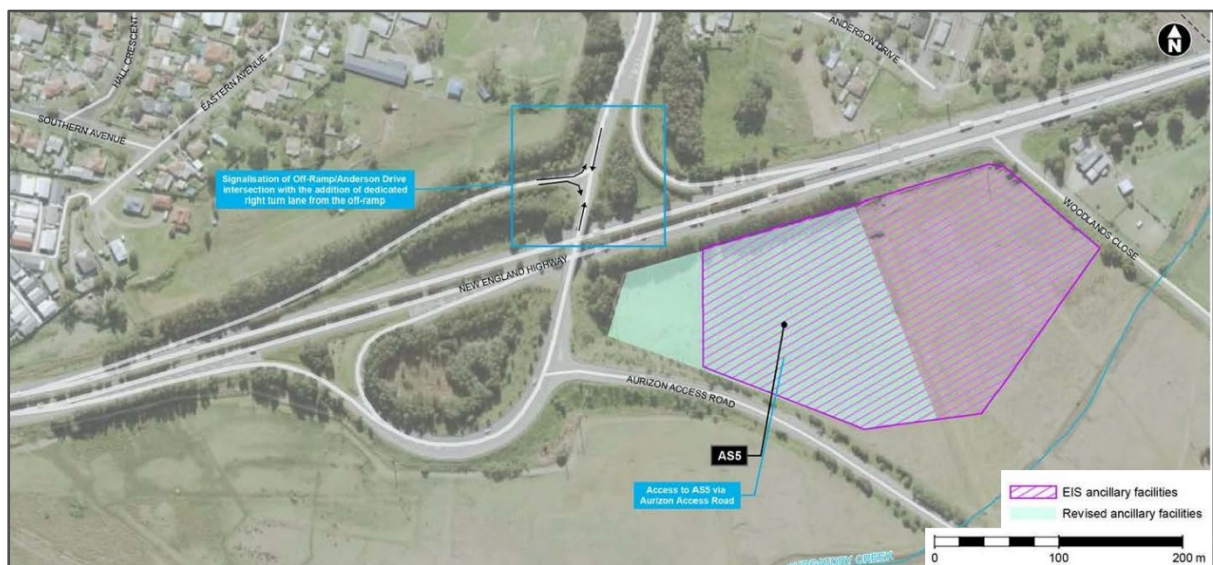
| Revised intersection arrangement at Tarro Interchange (Source: RtS)
